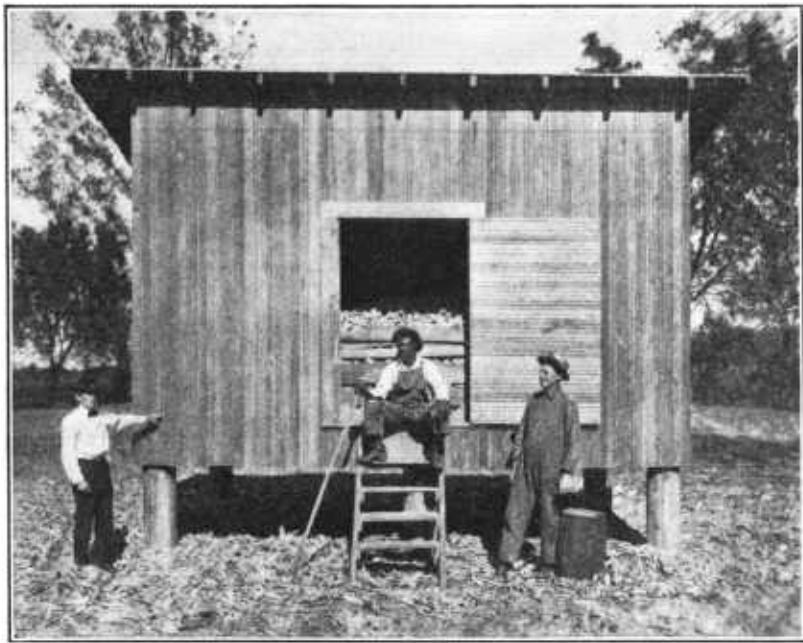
A satisfactory corncrib built by an enterprising farmer of Waycross, Ga. This was formerly a slatted crib that could not be fumigated. The floor was tightened and the walls covered with heavy building paper and a layer of tongue-and-groove boarding. Corn has been protected from weevils by fumigation in this crib for over five years.
